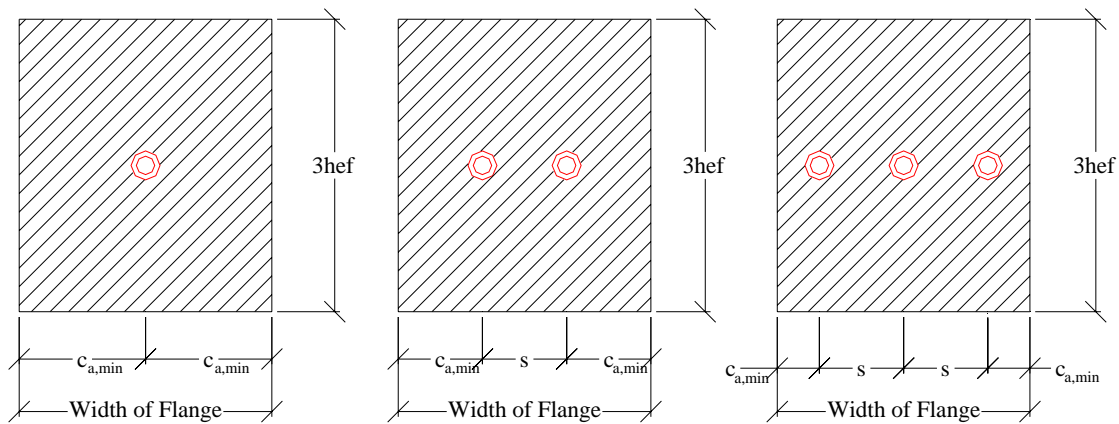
Concrete breakout – projected failure areas for specimens with a 3 in. haunch (A_{Nc})
